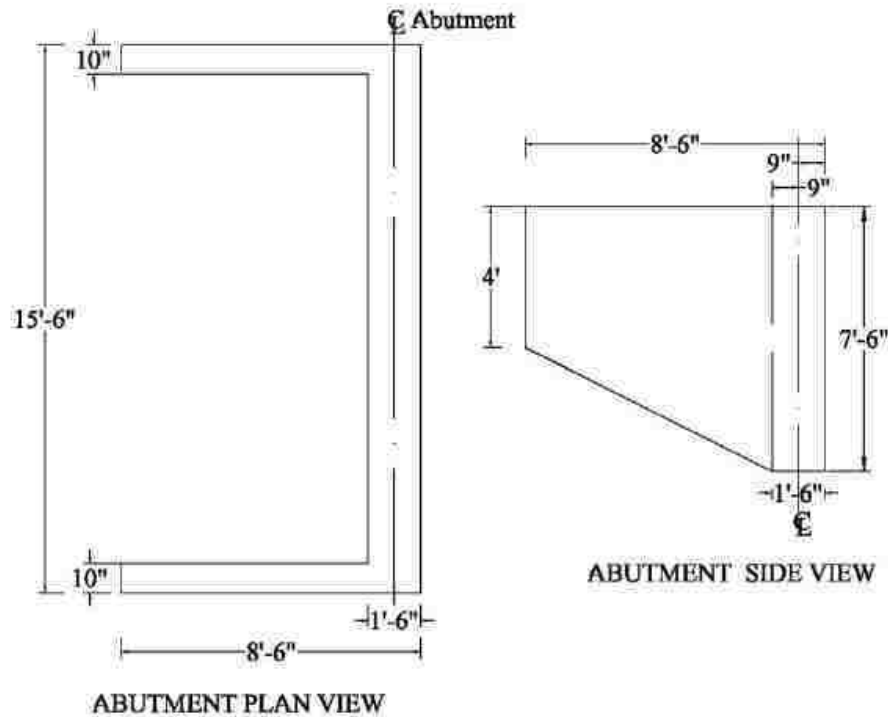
Plan and profile view of longitudinal wingwalls (Bozorgzadeh et al. 2008).
